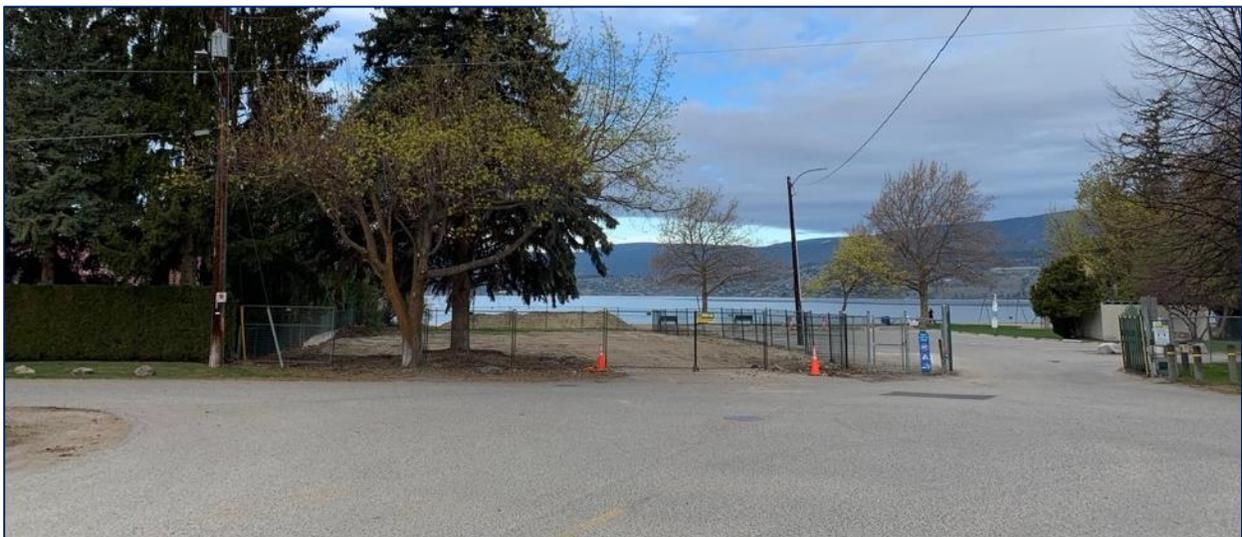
Current View from Hobson Cr. / Sarsons Rd. Intersection
